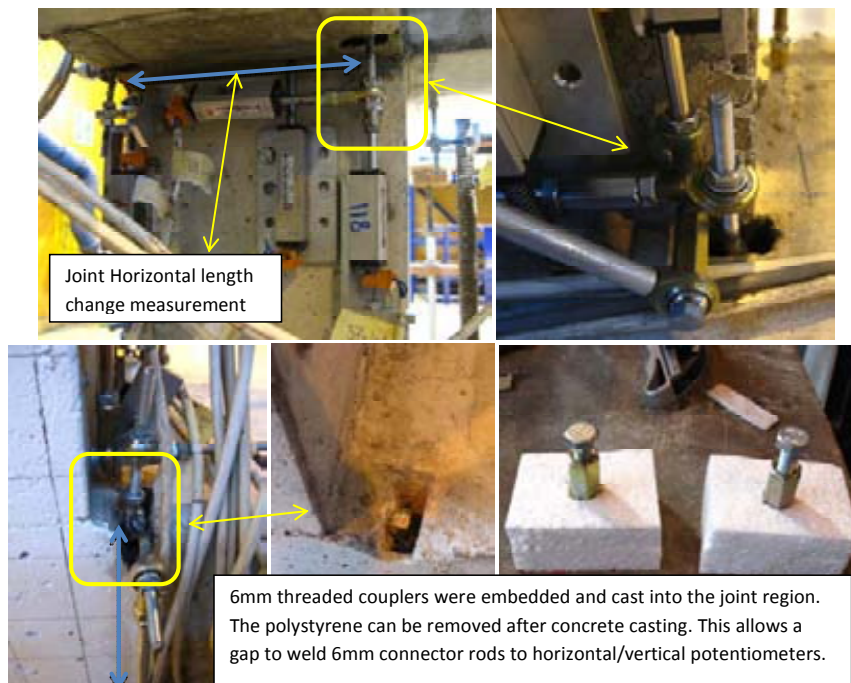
Instrumentation for measuring joint shear distortion of beam-column joints with slab and transverse beams.
